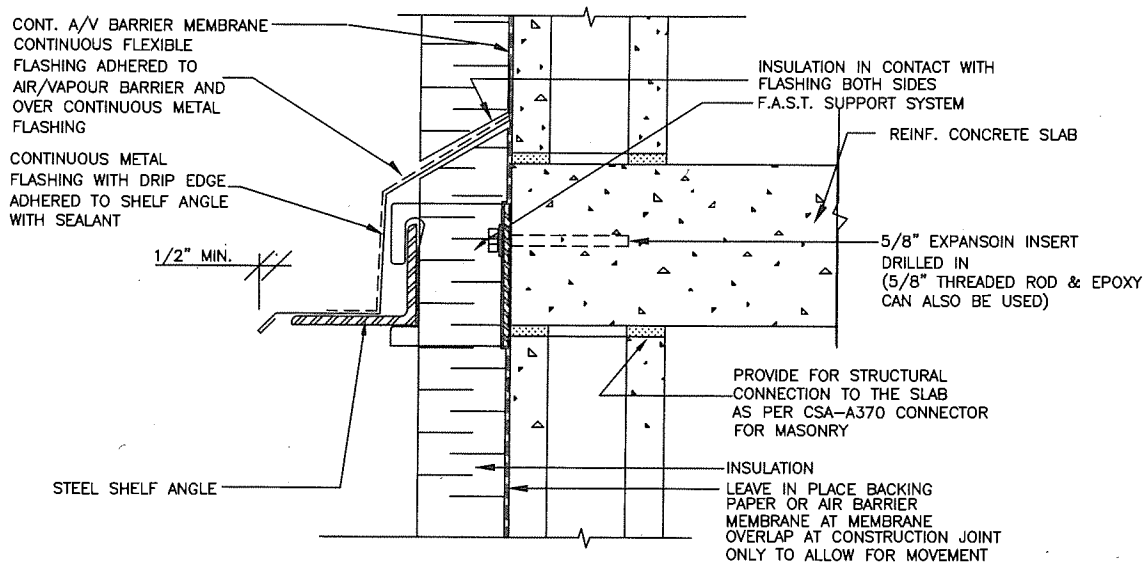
Membrane (Air Barrier) Detail at Movement Joint
